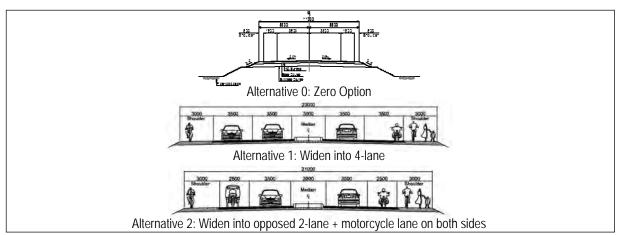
Typical Cross Sections of Alternatives (General Section)
